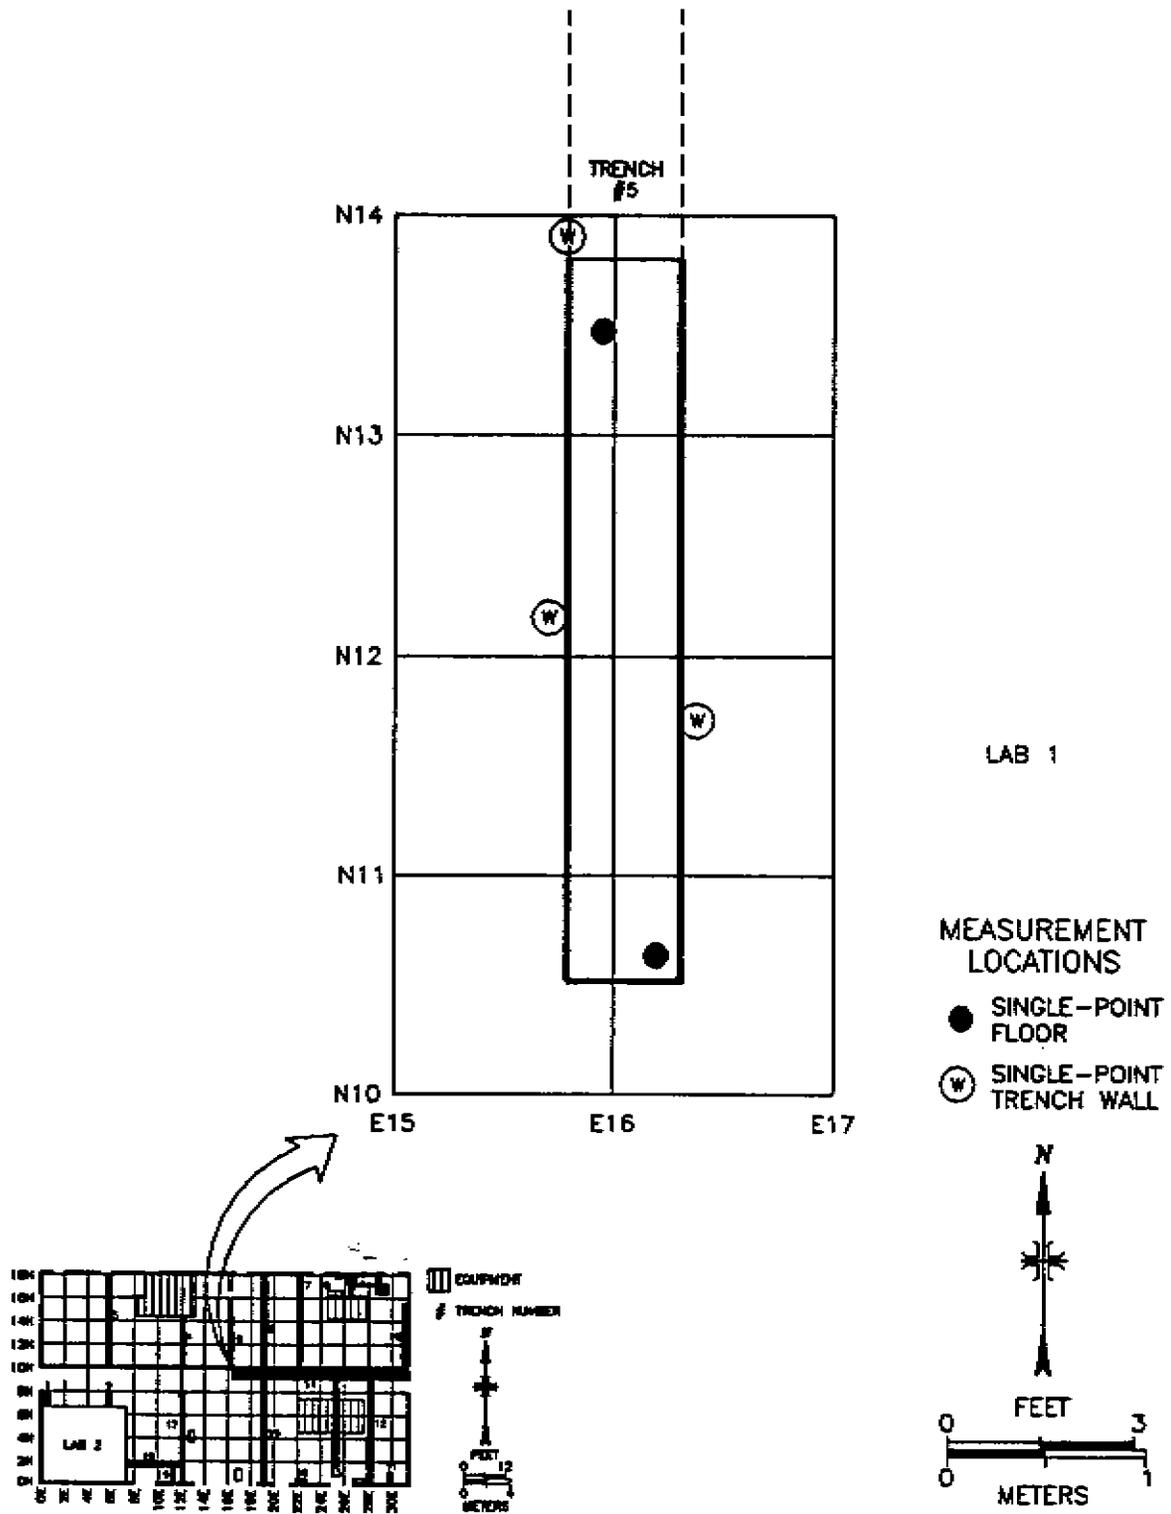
Building 23, Lab 1, Trench 5, Indicating Measurement Locations
